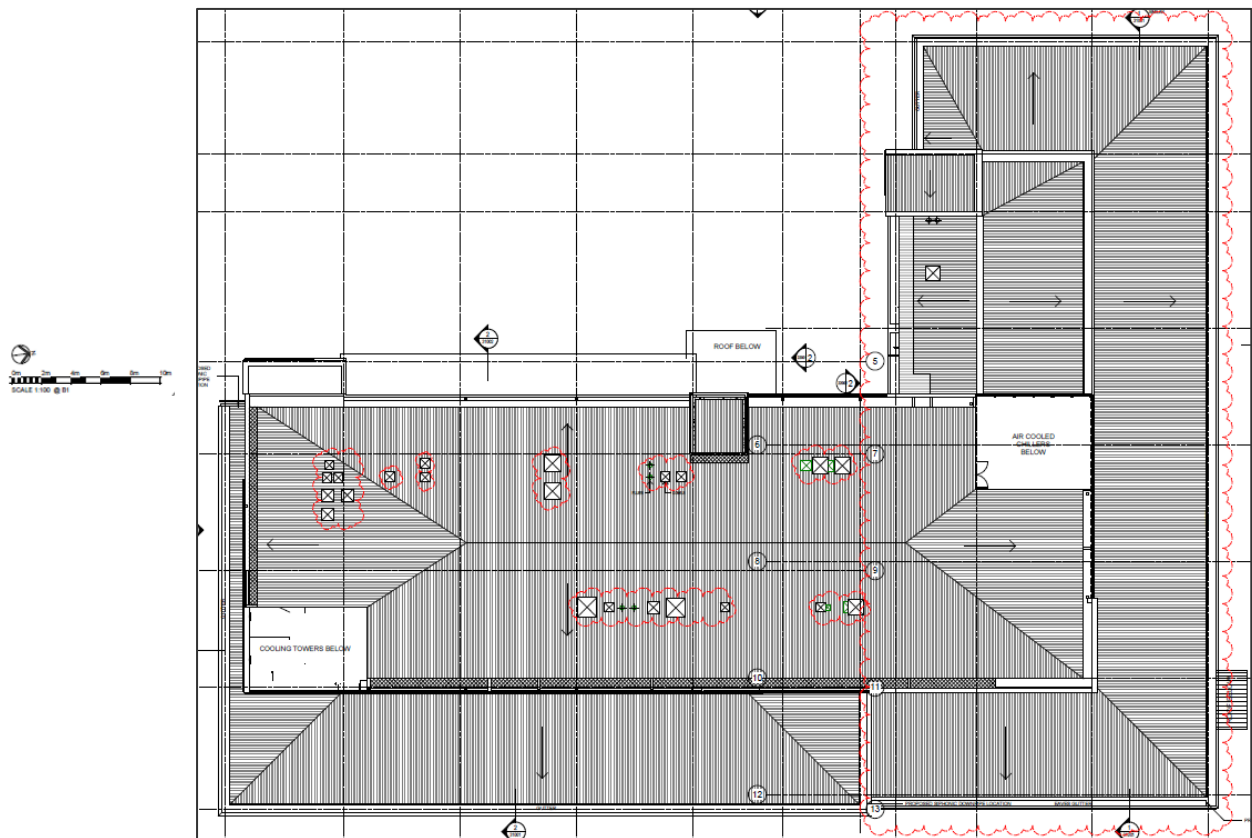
| Proposed Level 2 Plan (SSD 8980 MOD 1)
